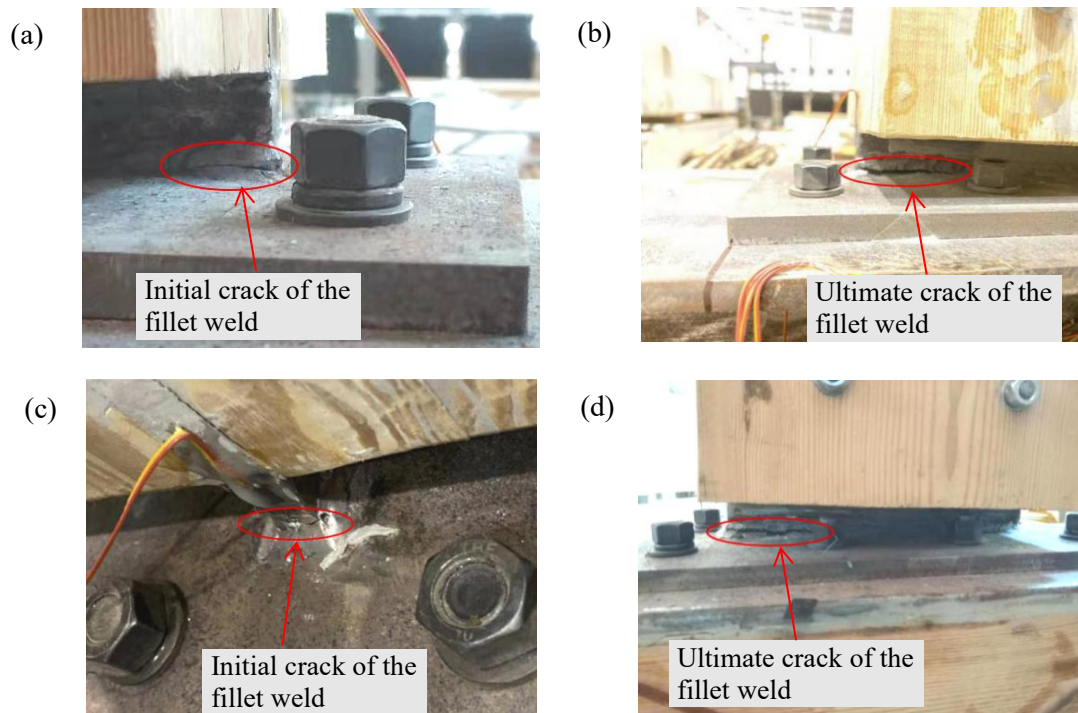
Failure phenomenons of JS joint and JSTC joint:(a)-(b) the crack of the fillet weld of JS joint;(c)-(d) the crack of the fillet weld of JSTC joint.
